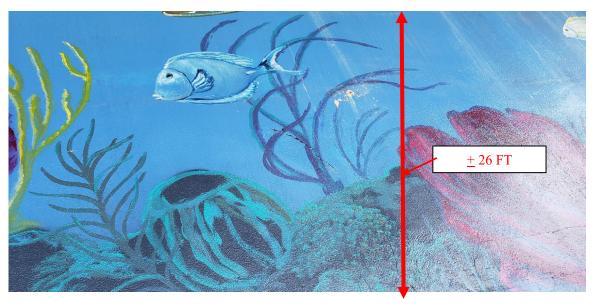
Location 11: Approximately 26 ft long new 12x16 concrete column. See detail 2/S102.
